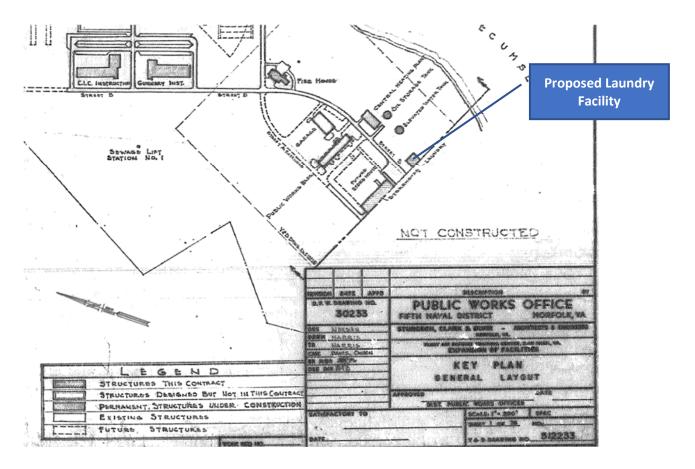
Excerpt from undated General Layout Key Plan for Dam Neck Annex showing planned location of the Laundry Facility
